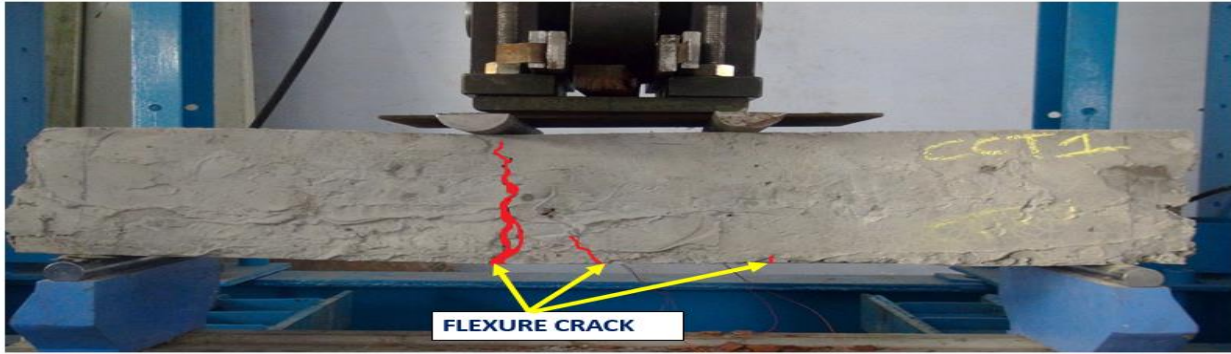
Failure of sandwich beam with cement mortar as bonding agent
